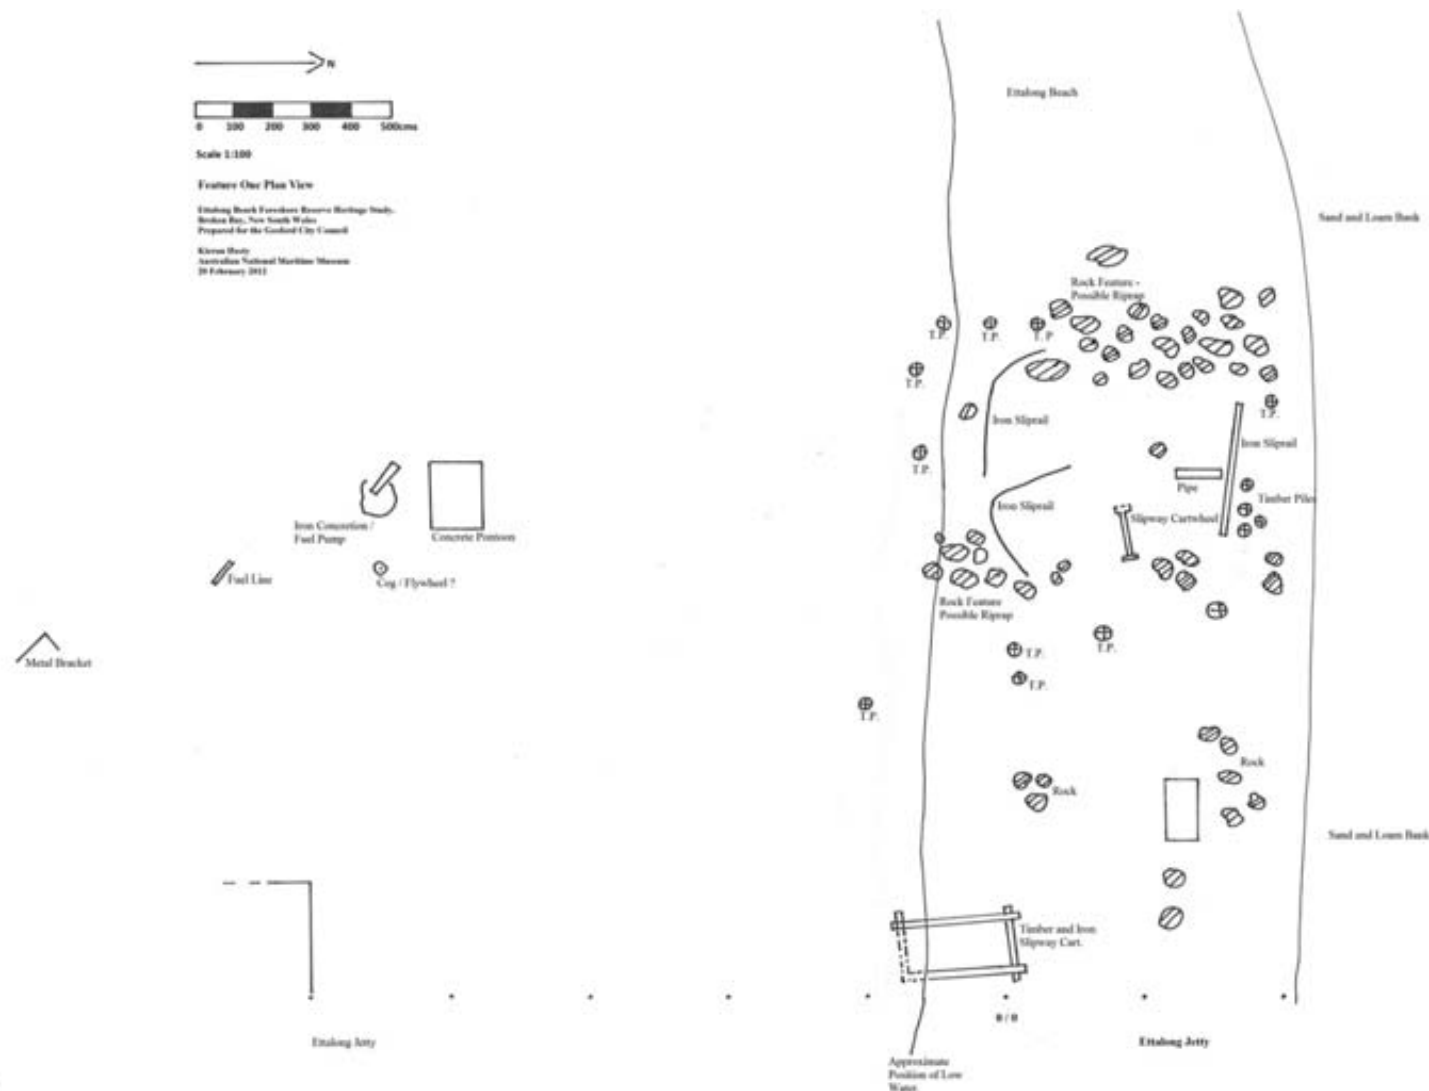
Sketch Plan of Feature One. (Source: ANMM 2012)
